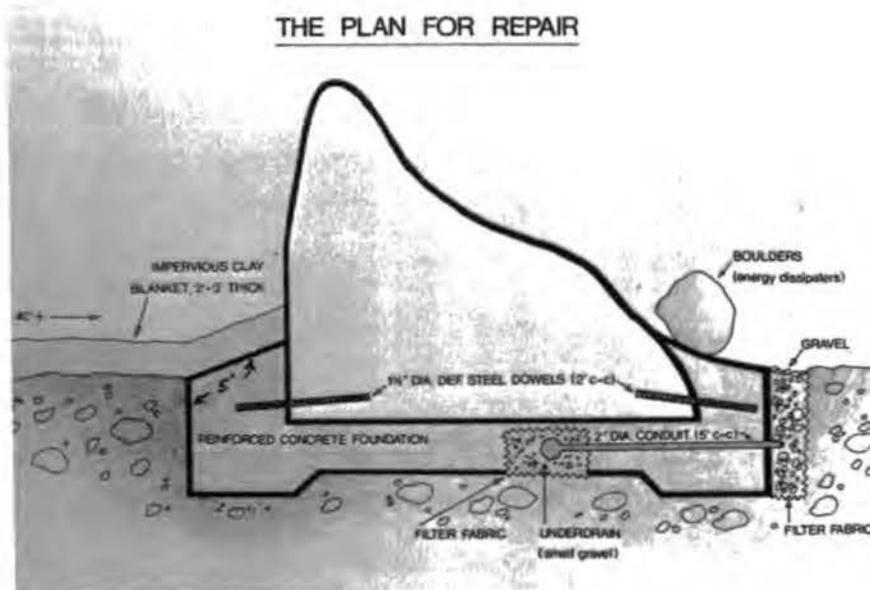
Diagram showing planned changes to the dam section so to improve stability and retard foundation seepage. Clay blanket actually placed is greater than shown on plan.
